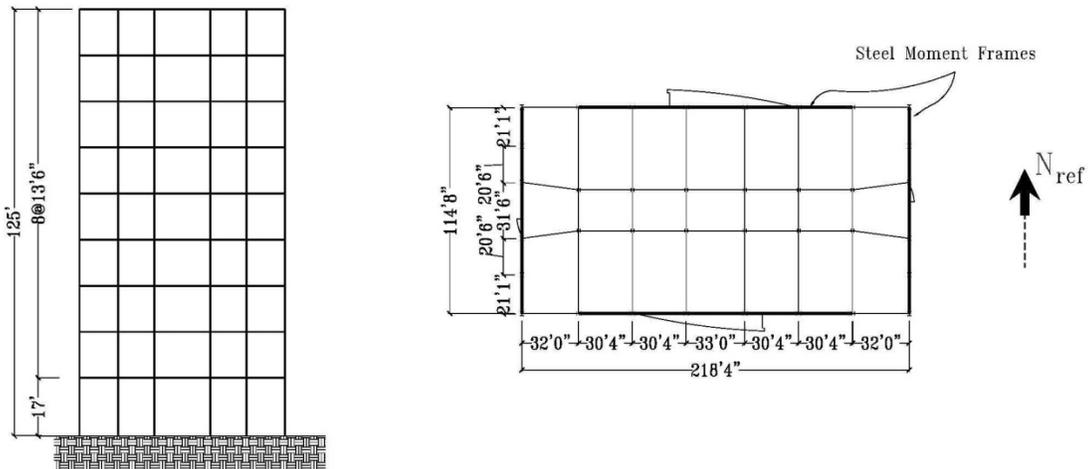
Elevation of typical steel moment frame (N-S Direction) and floor plan of the building
